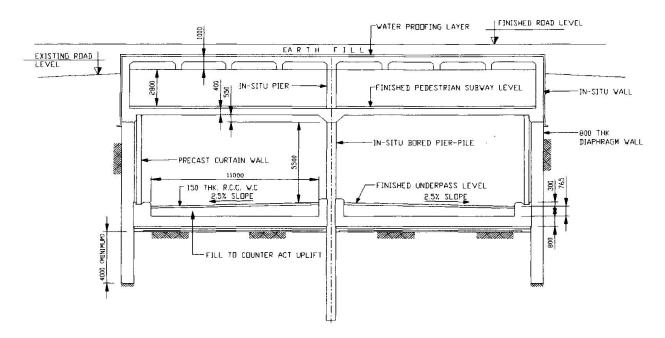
Cross Section of Underpass and Pedestrian Subway at Intersection
